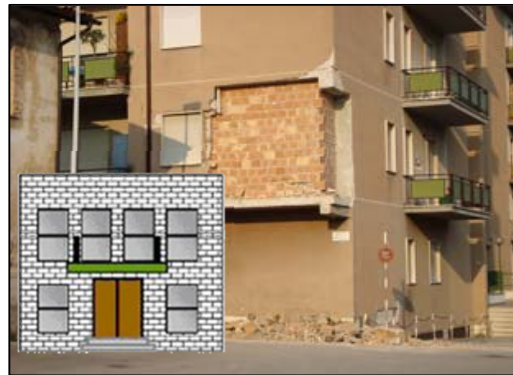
Immediate Occupancy (S-1) - Note damage to facade, but underlying structural brick in working condition.
